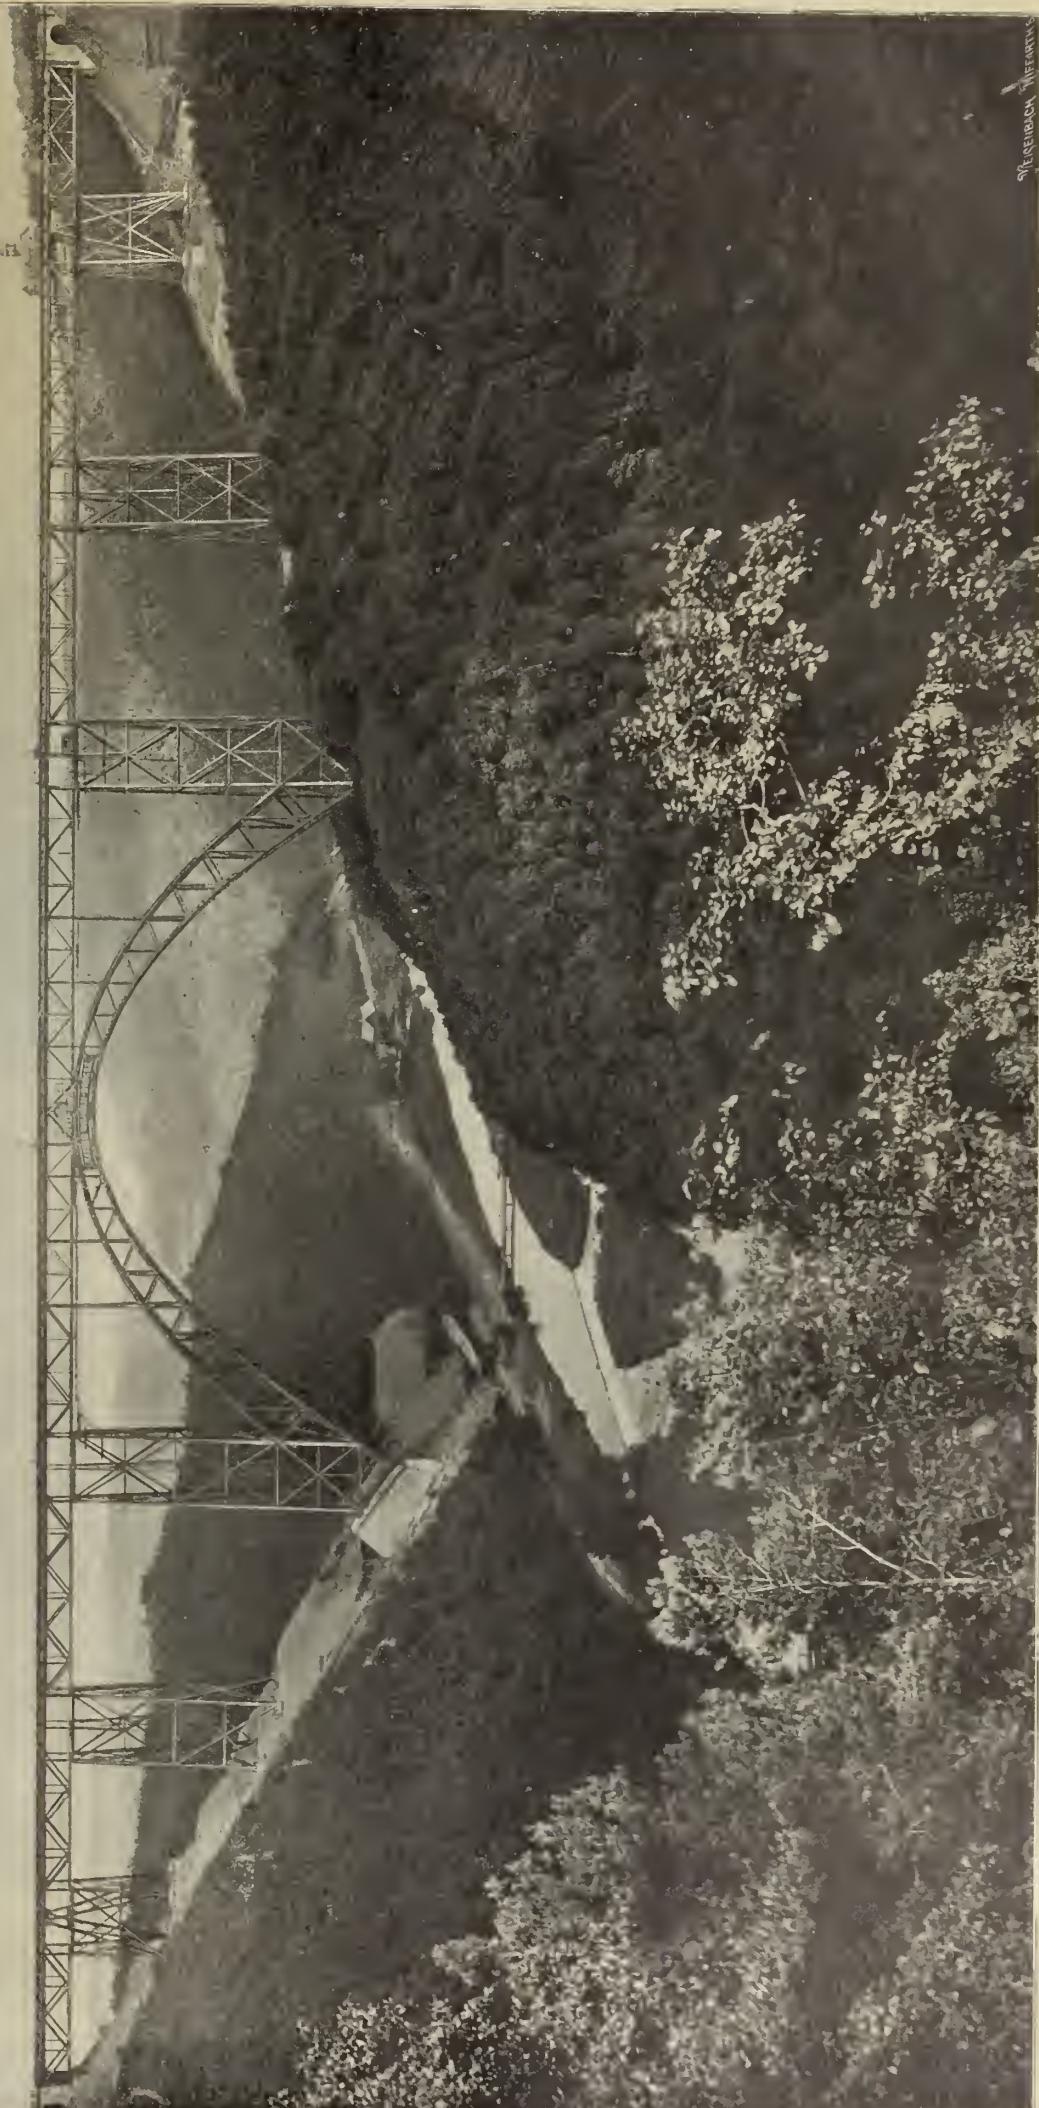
Road- and Railway Bridge over the North Sea-Baltic Canal near Levensau. 1892—93.
